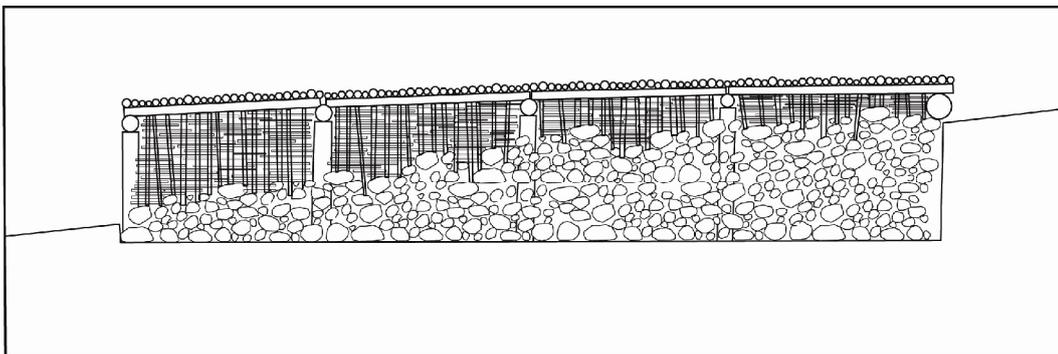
a. View from east- the section of the House D showing the placement of second cover of the roof construction.
